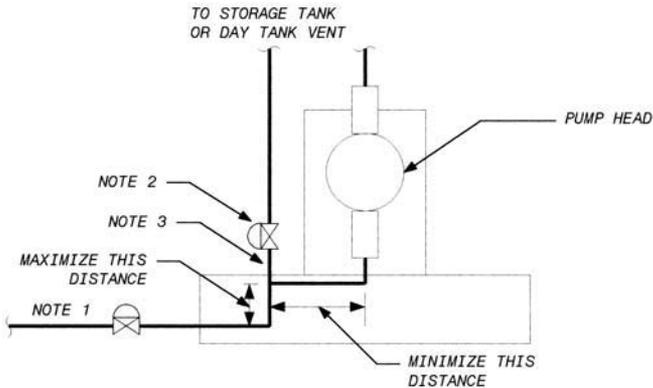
Metering pump suction piping detail. *Notes:* (1) Sodium hypochlorite metering pump suction piping shall be routed to slope continuously downward from the day/bulk storage tank. (2) Valve shall remain open except when day/bulk storage tank level is below the pump centerline. (3) Locate tee for vent as close as possible to pump suction connection. The vent piping shall be connected to the run of the tee in the vertical position. Vent piping shall not be connected to the branch of the tee.
